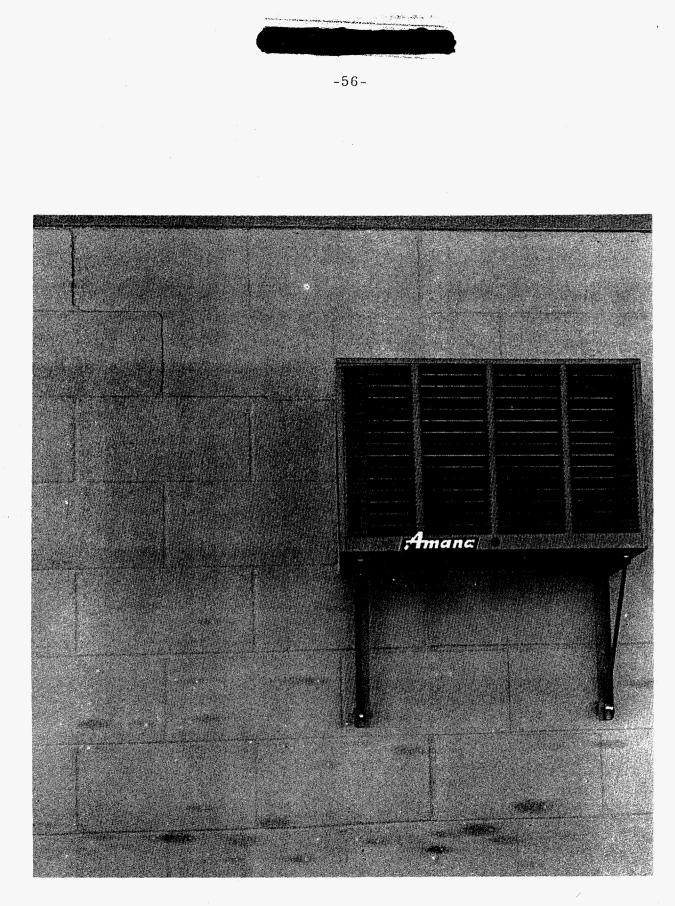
Typical existing crack, 1 Dec. 1965.
